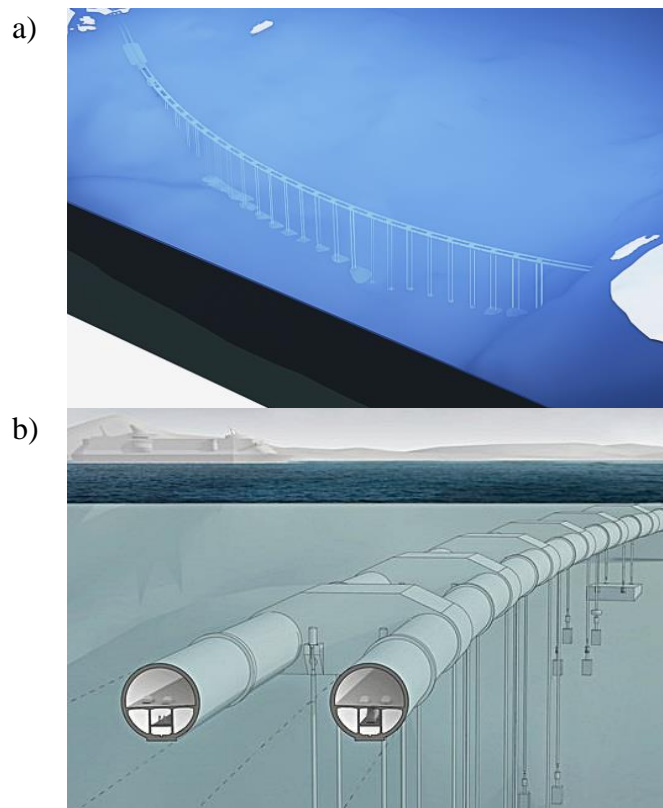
Submerged Floating Tunnel (SFT); a) General view; b) Cross-section; (Source: Snøhetta)
